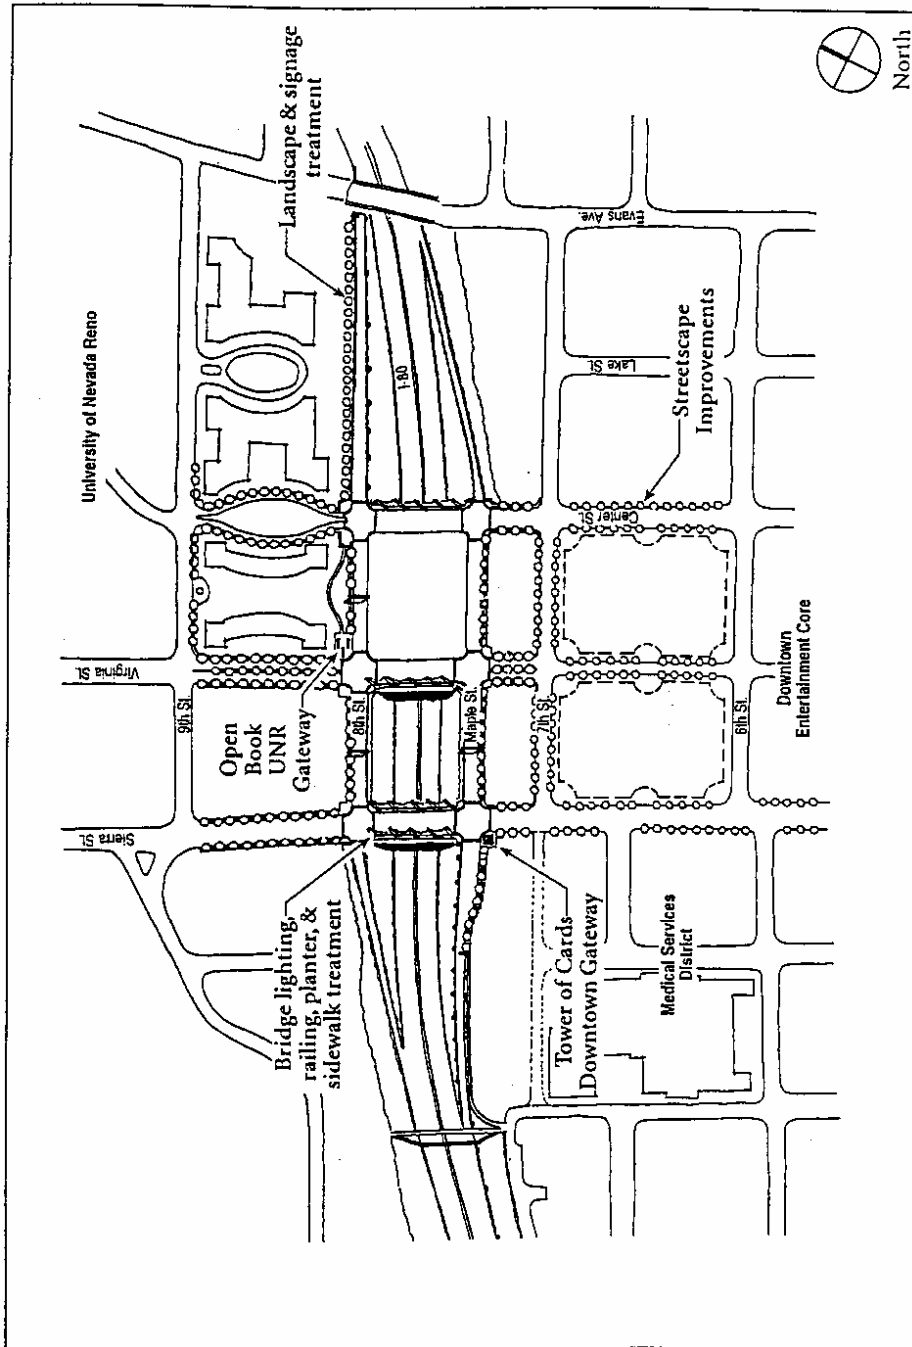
NORTH GATEWAY CONCEPTUAL MASTER PLAN
